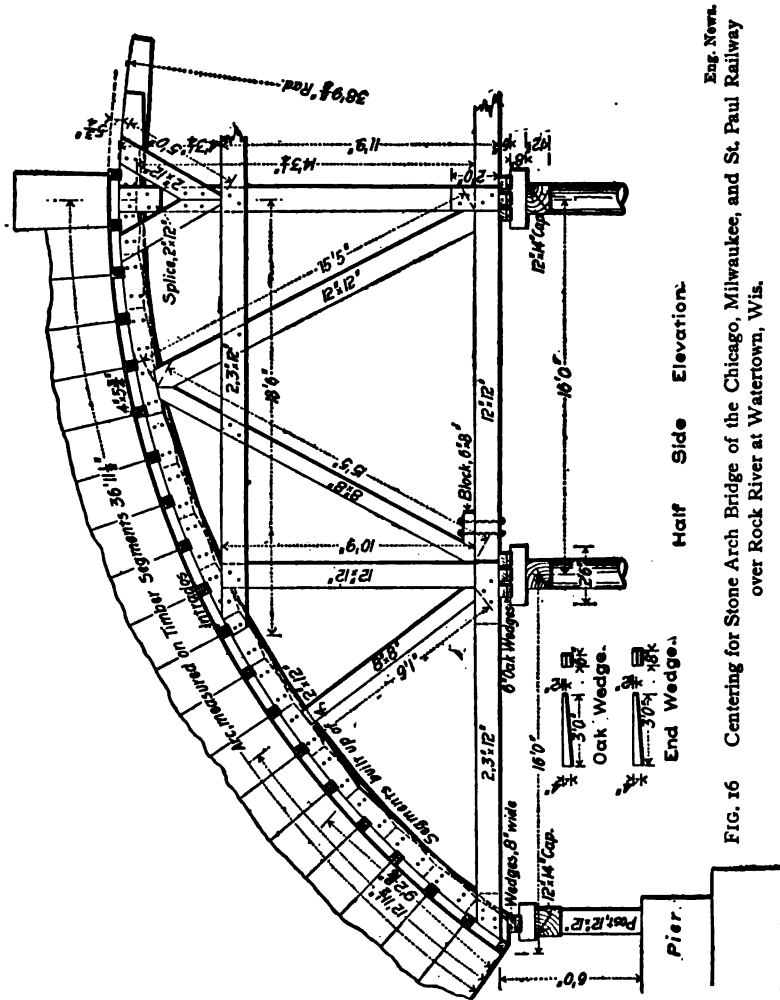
gives the dimensions and positions of the wedges under the centering for a stone arch bridge. The wedges were greased and secured in place to prevent slipping. For a half-tone view of the centering and arch ring under construction see Art. 75.
